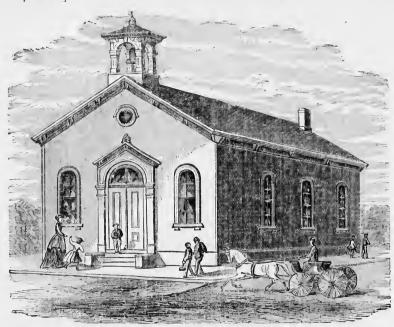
Design No. 13.-Front and Side Perspective, adapted to Fig. 78.
